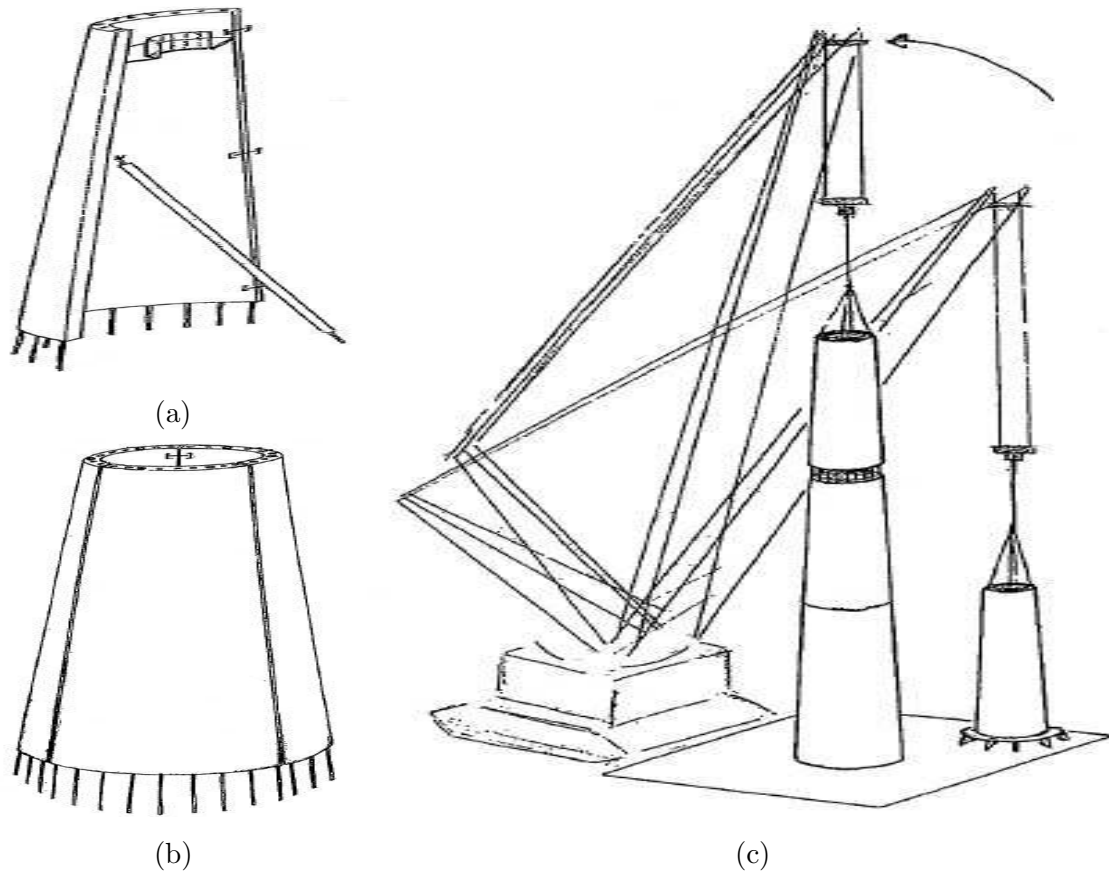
Prefabricated modular tower, taken from [29]; (a) element with strut; (b) pre-assembled tower segment; and (c) tower assembling
